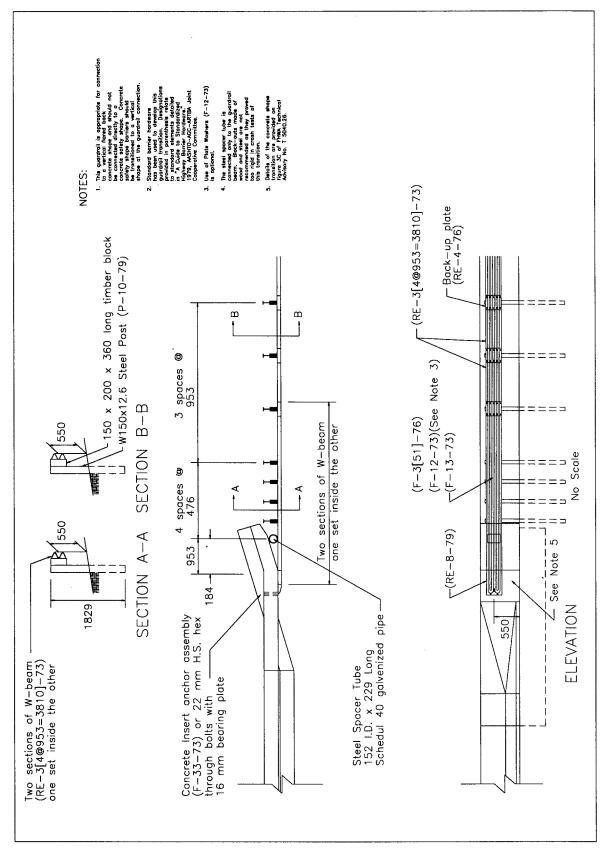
Details of the W-beam transition (on steel posts with timber blockouts).
